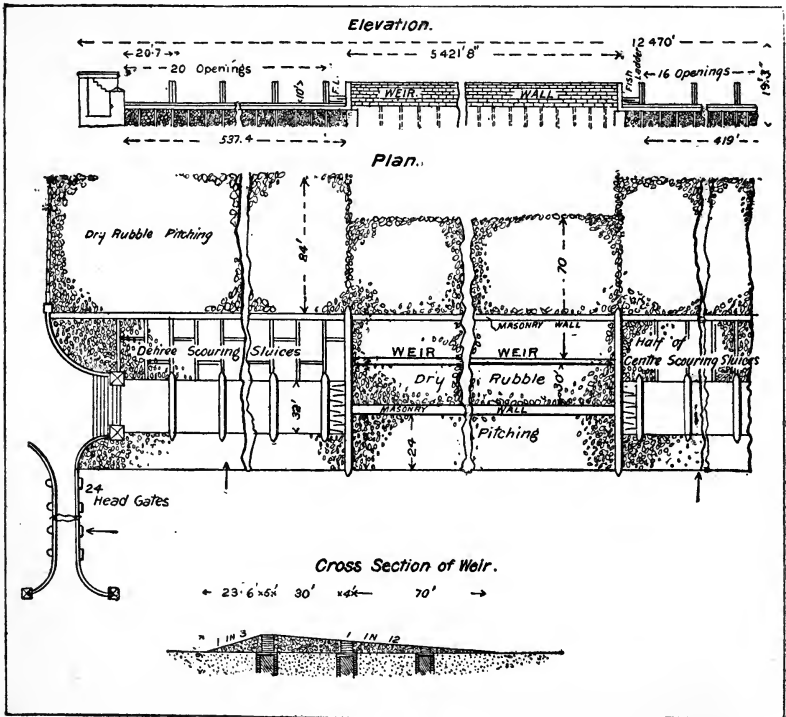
HALF-ELEVATION AND PLAN, AND SECTION OF SOANE WEIR, INDIA.
